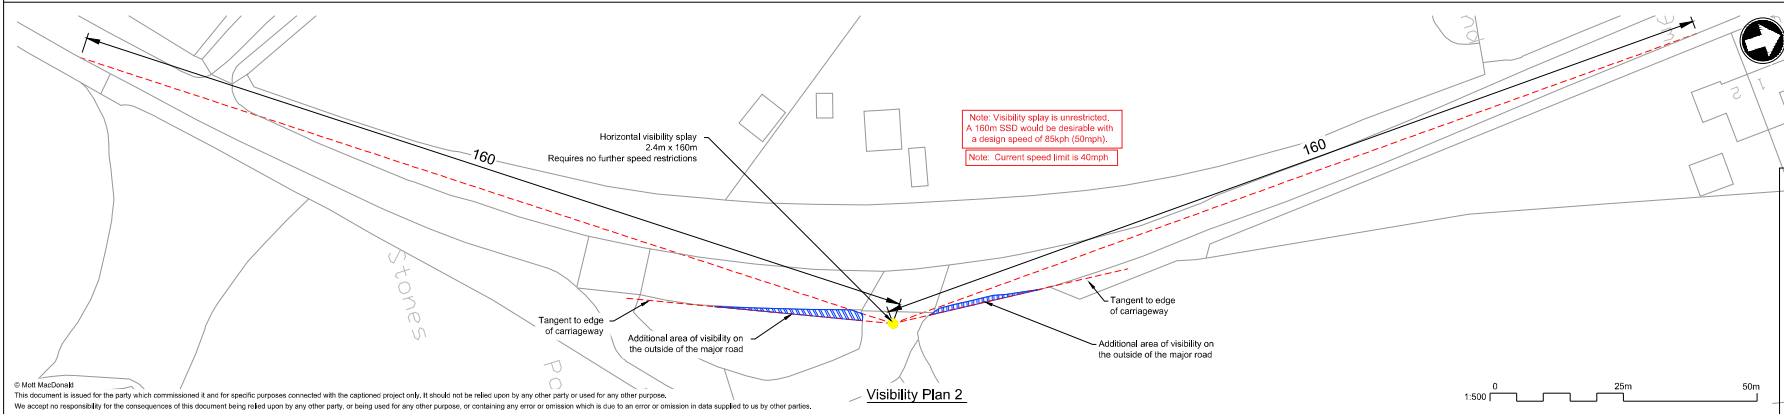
MMD-01-XX-DR-C-DRAFT
